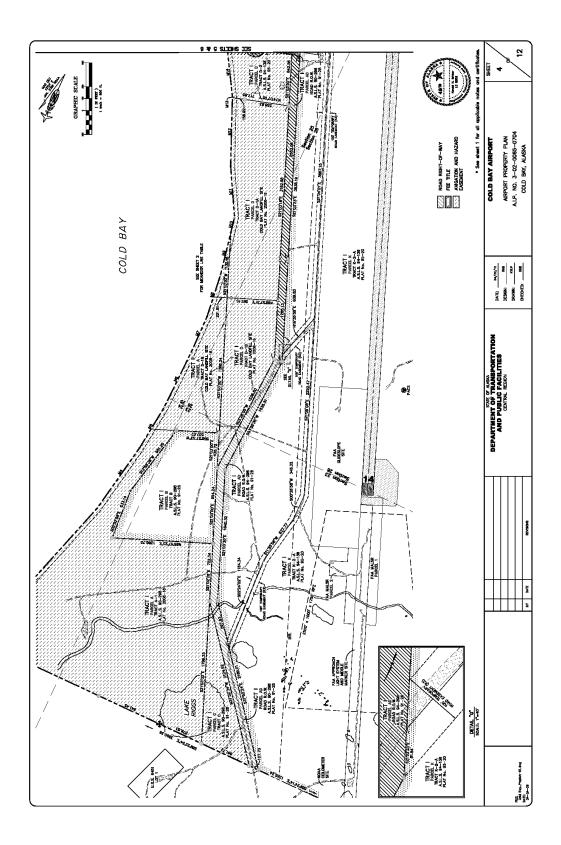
Airport Property Plan Example Page 2 of 2
